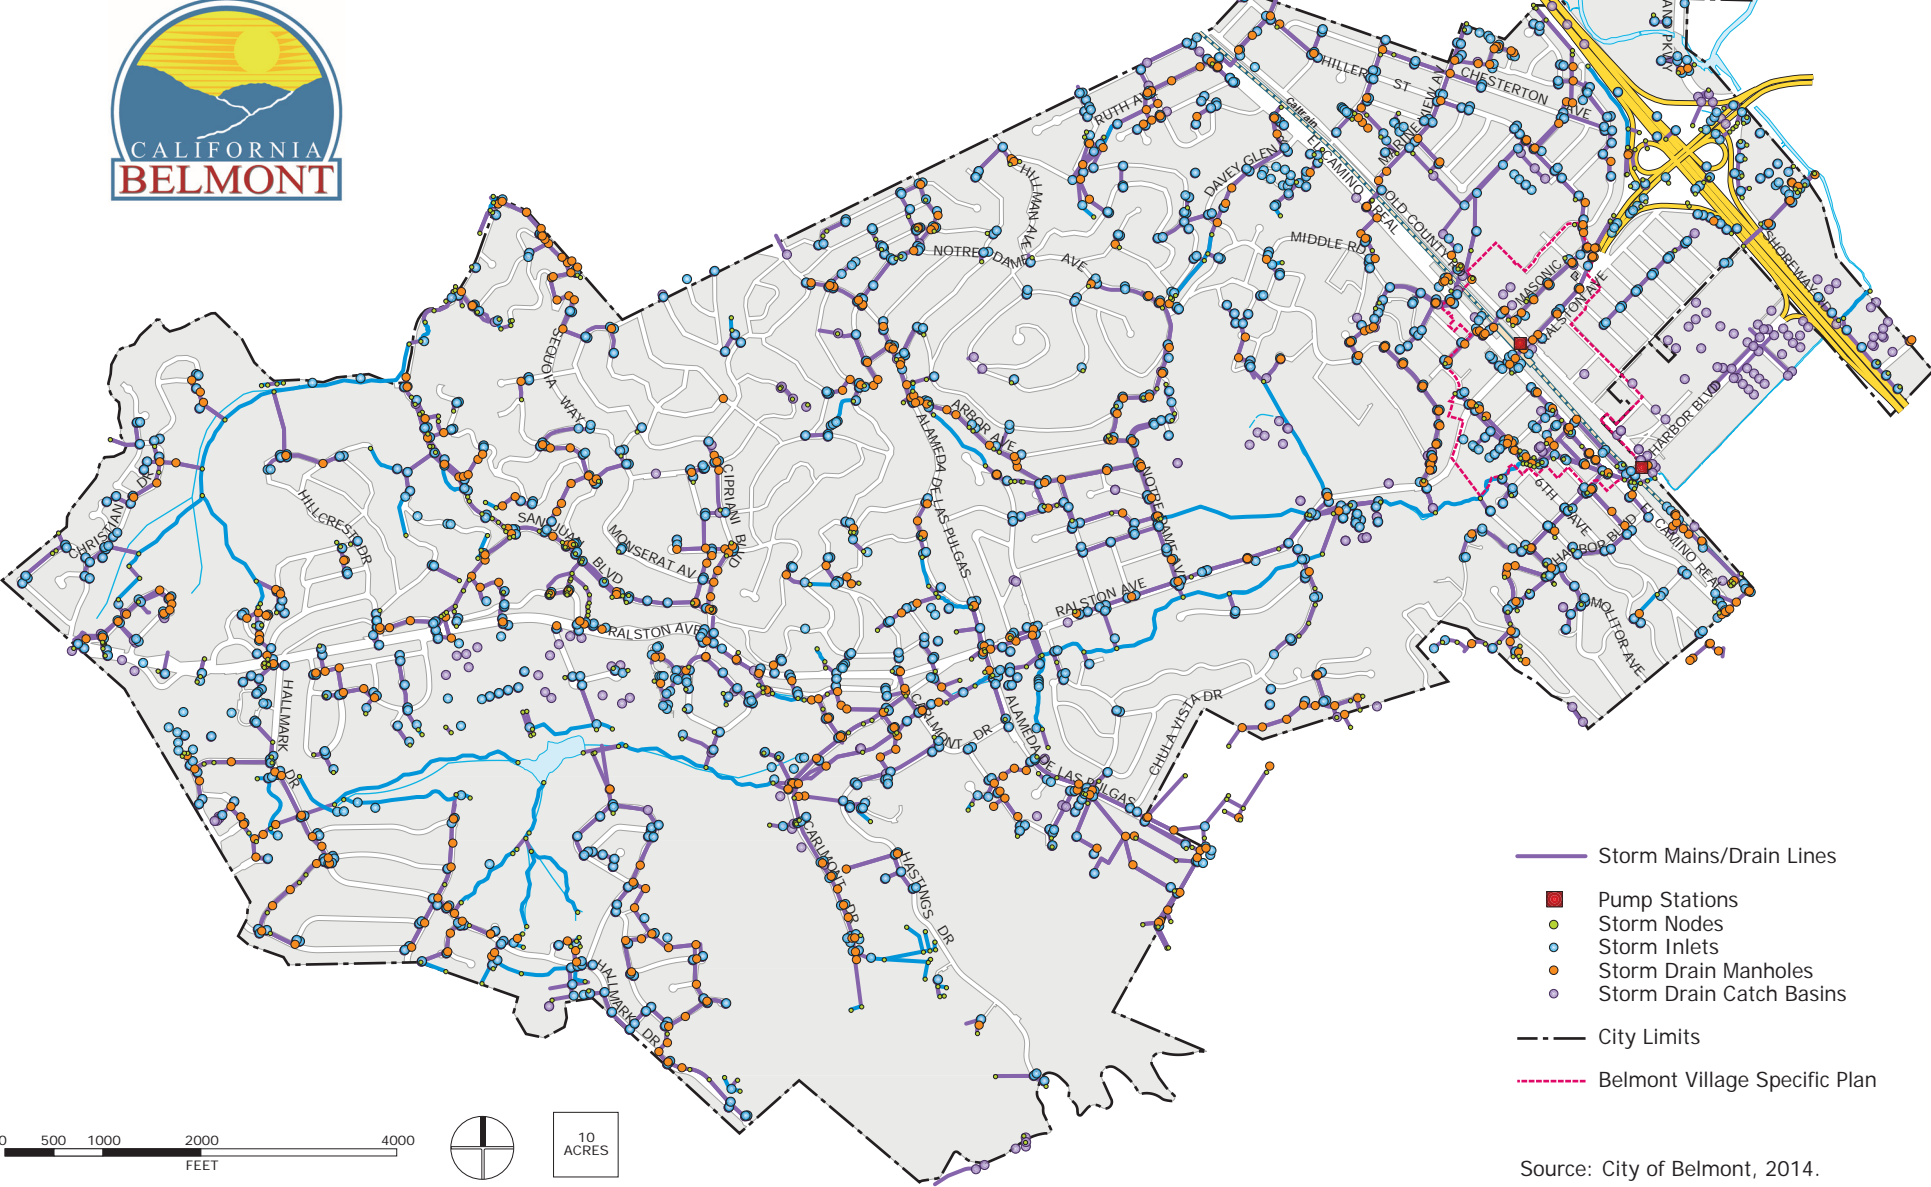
Existing Stormwater System in the BVSP Area
